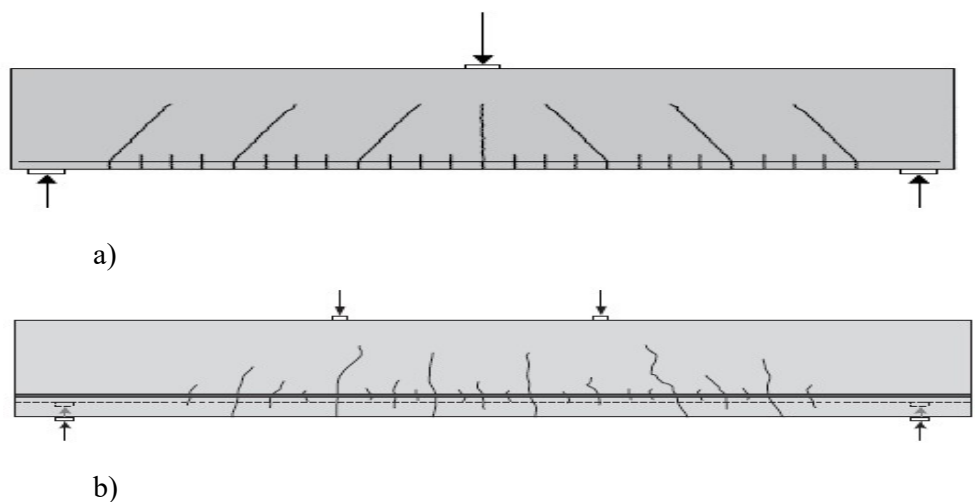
Flexural cracks. a) Three-point loading b) Four-point loading (Gilbert and Nejadi, 2008)
